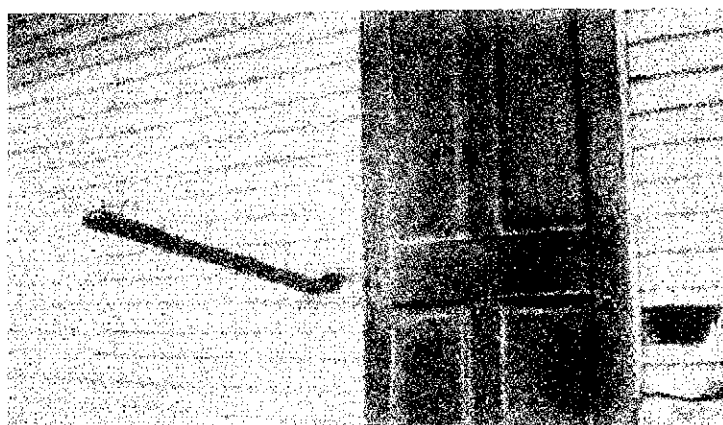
Wooden wall of the house pierced by plank flying almost horizontally, Kansas, June 1928 (Flora, 1953).
